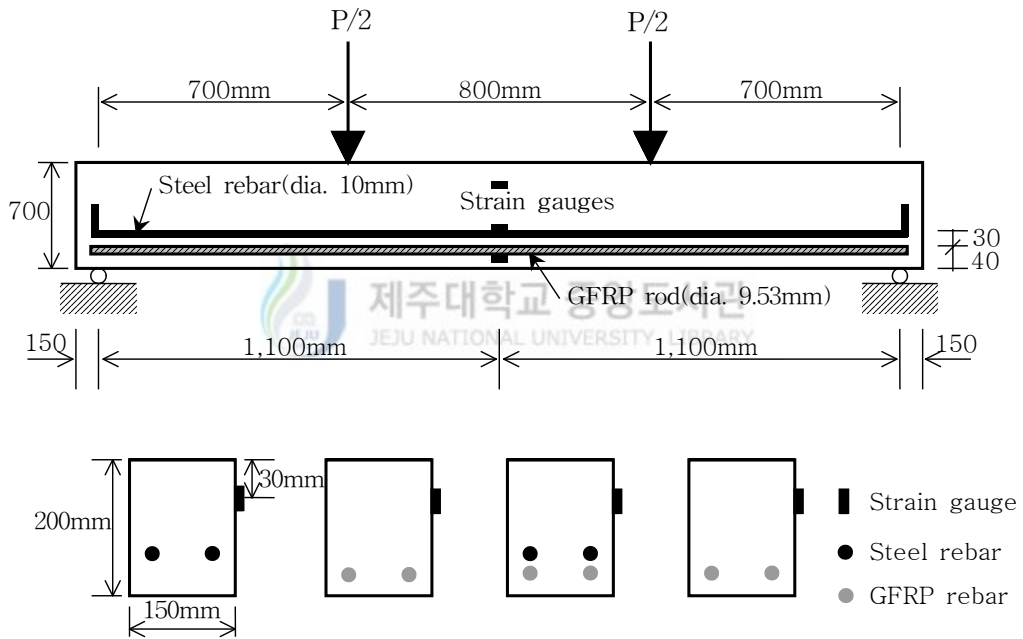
Details of reinforcement, dimensions and loading layout of test beam
